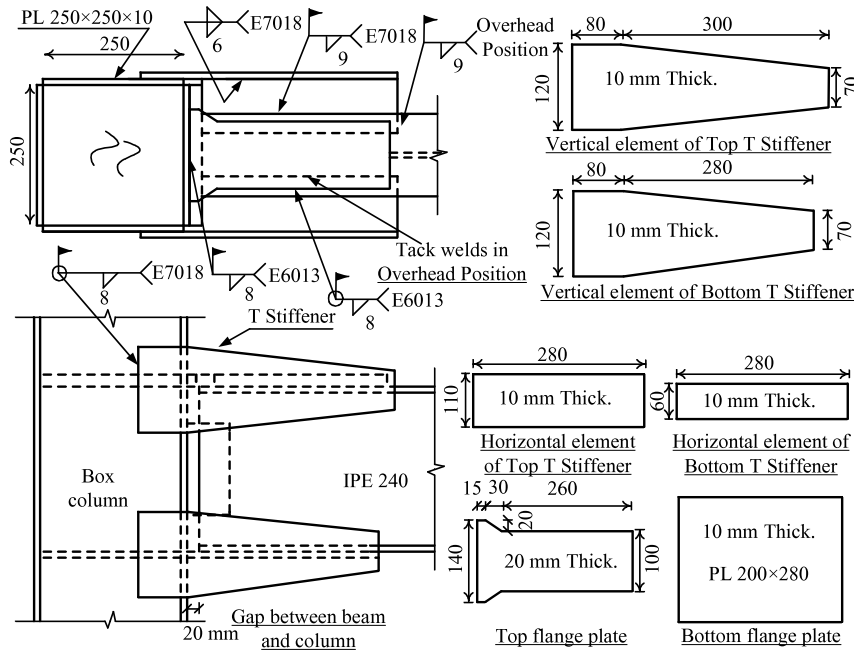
Connection details of specimen RC7, Ghobadi et al. [5].
